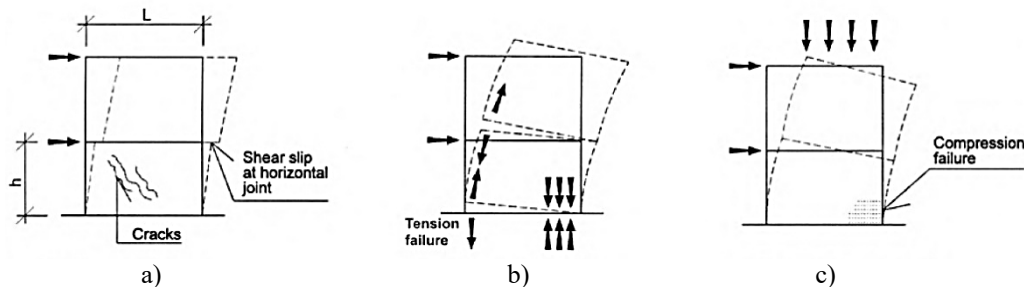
Failure mechanisms for horizontal panel connections: a) shear slip along a horizontal joint; b) flexural tension failure, and c) flexural compression failure (based on [24]).
